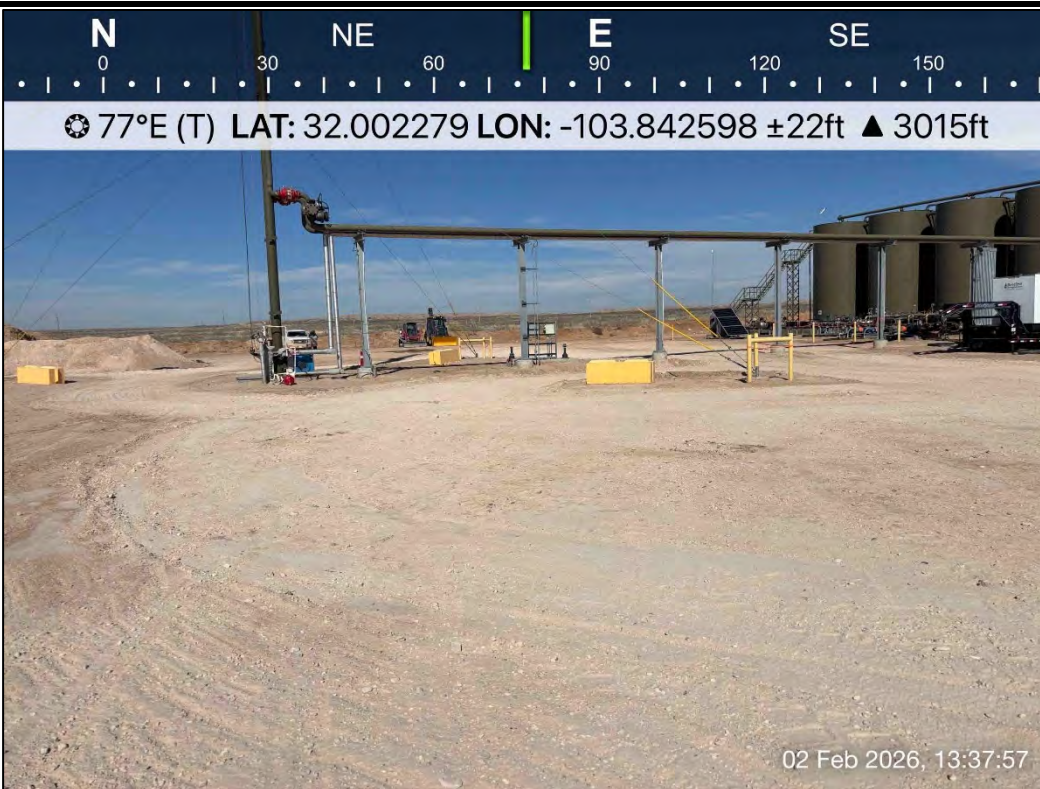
Northeastern view of excavation extent. 2/02/2026
